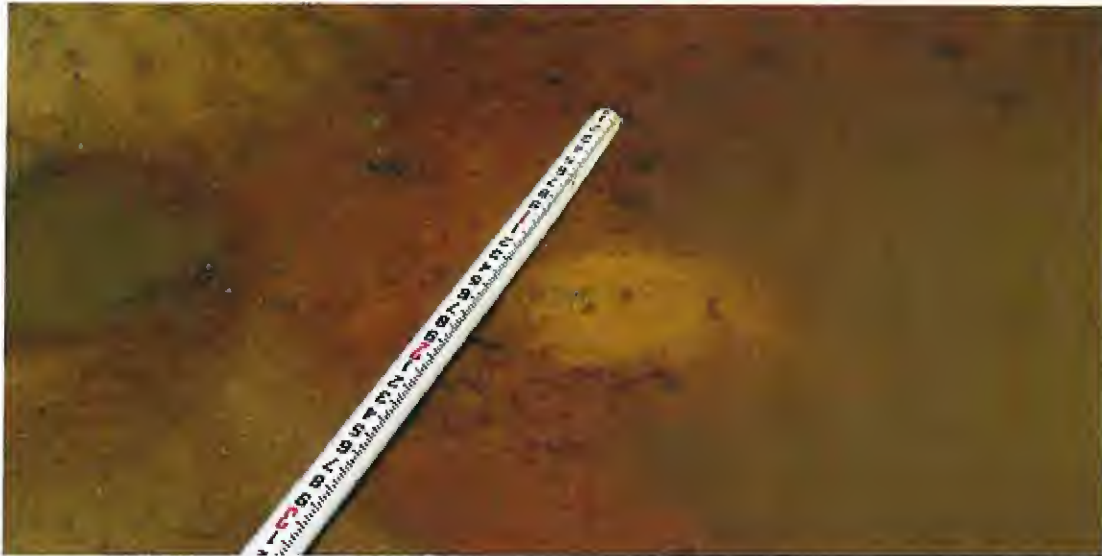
View of bubbling occurring at a boil located in sediment at the stilling basin just downstream of the concrete slope. Boils, which were noted during the last inspection, were also observed during this inspection. However, there did not appear to be as many or as large as noted in the previous inspection.
